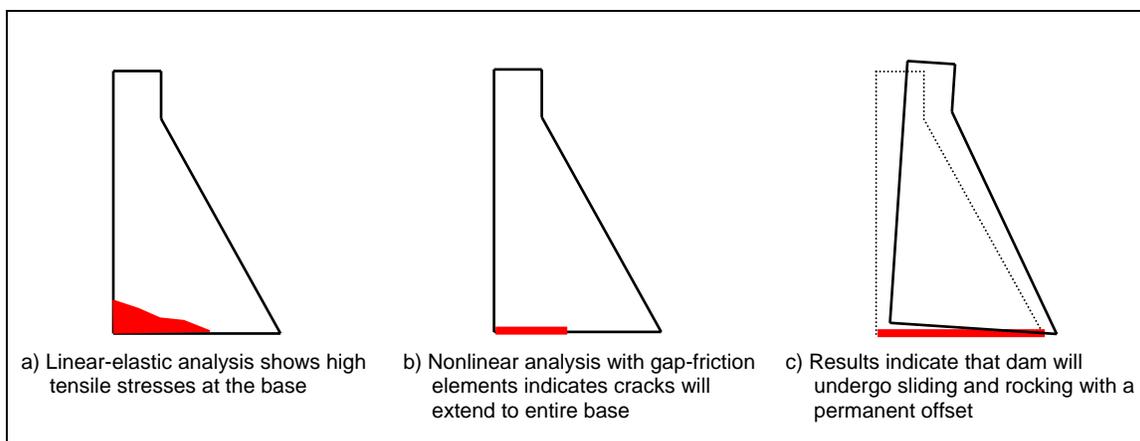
Example of sliding and rocking of a typical gravity dam
